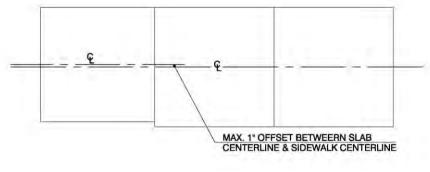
Horizontal Alignment of Bluestone Sidewalk
